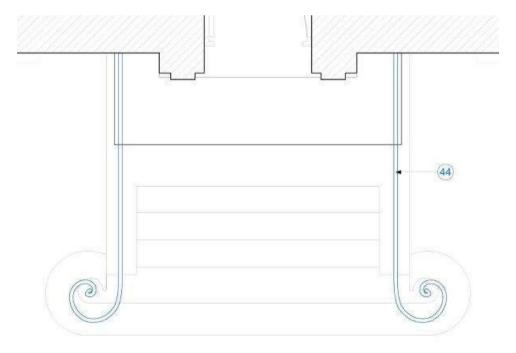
Drawing showing proposed handrail design (see drawing 1502-AR-401 for further details)
